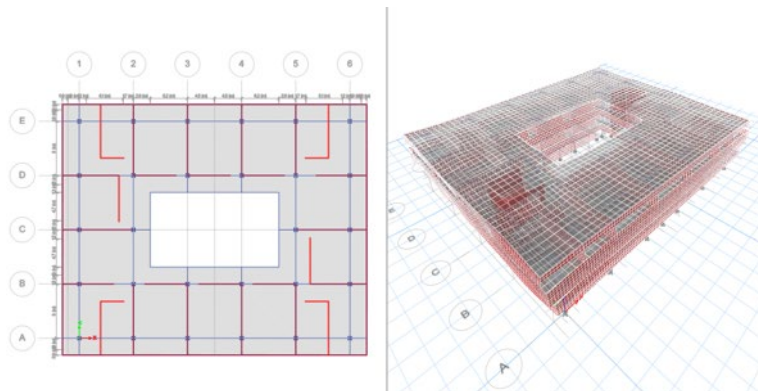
3D elevation view of the finite element model. Including stands and walls without connecting them to the frame system. Fundamental mode 0.20 sec.
